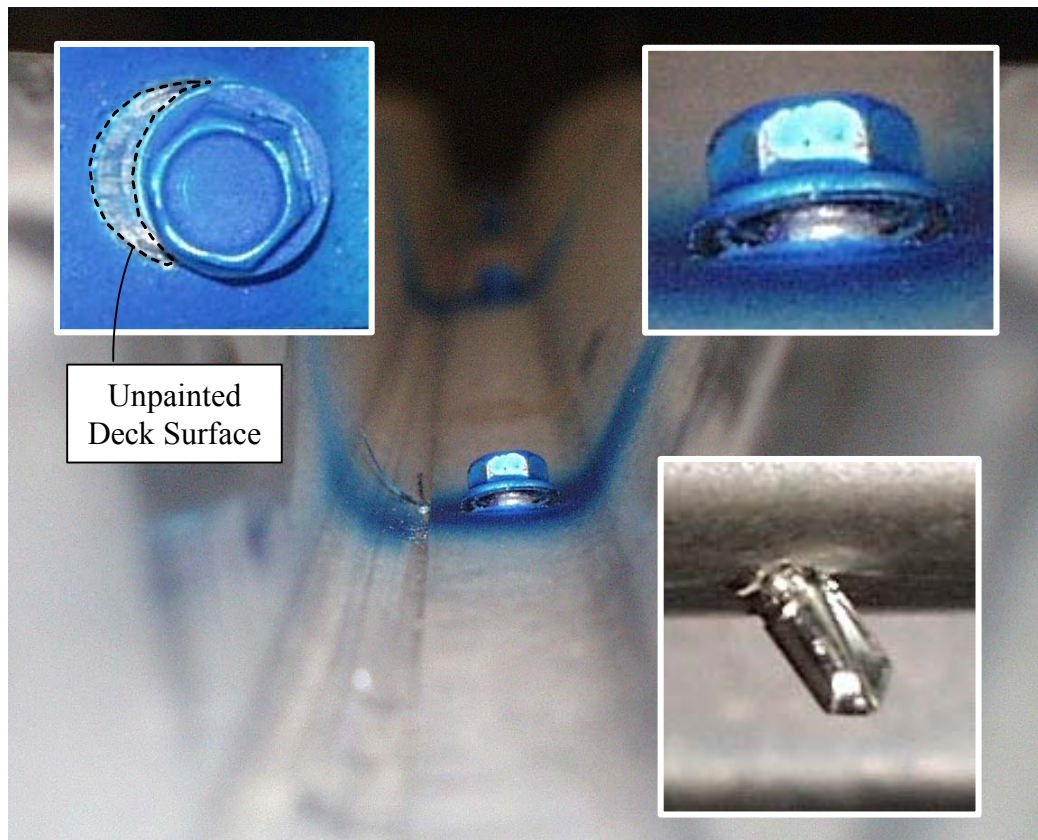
TYPICAL STITCH FASTENER TIPPING AND BEARING DEFORMATION.
